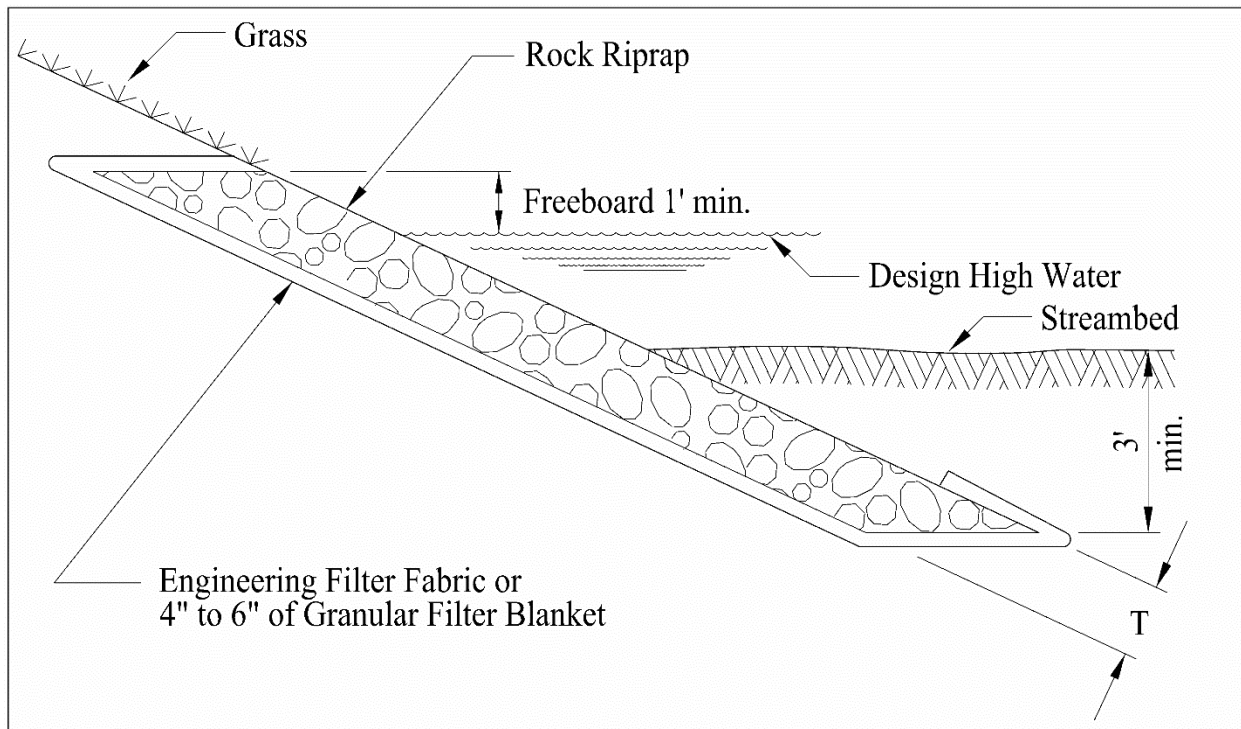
Riprap Blanket and Toe Trench Detail
